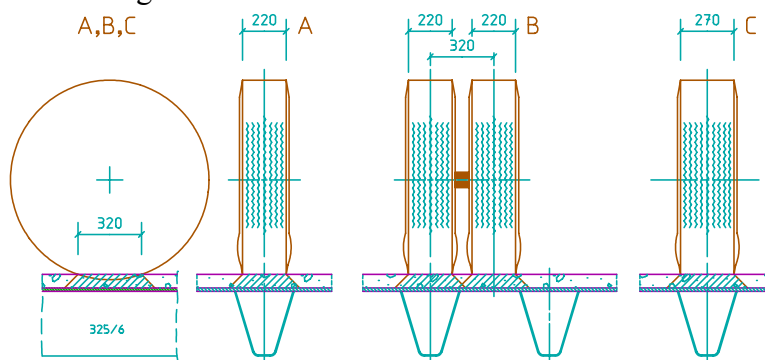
Wheels on deck plate with trapezoidal stiffeners
